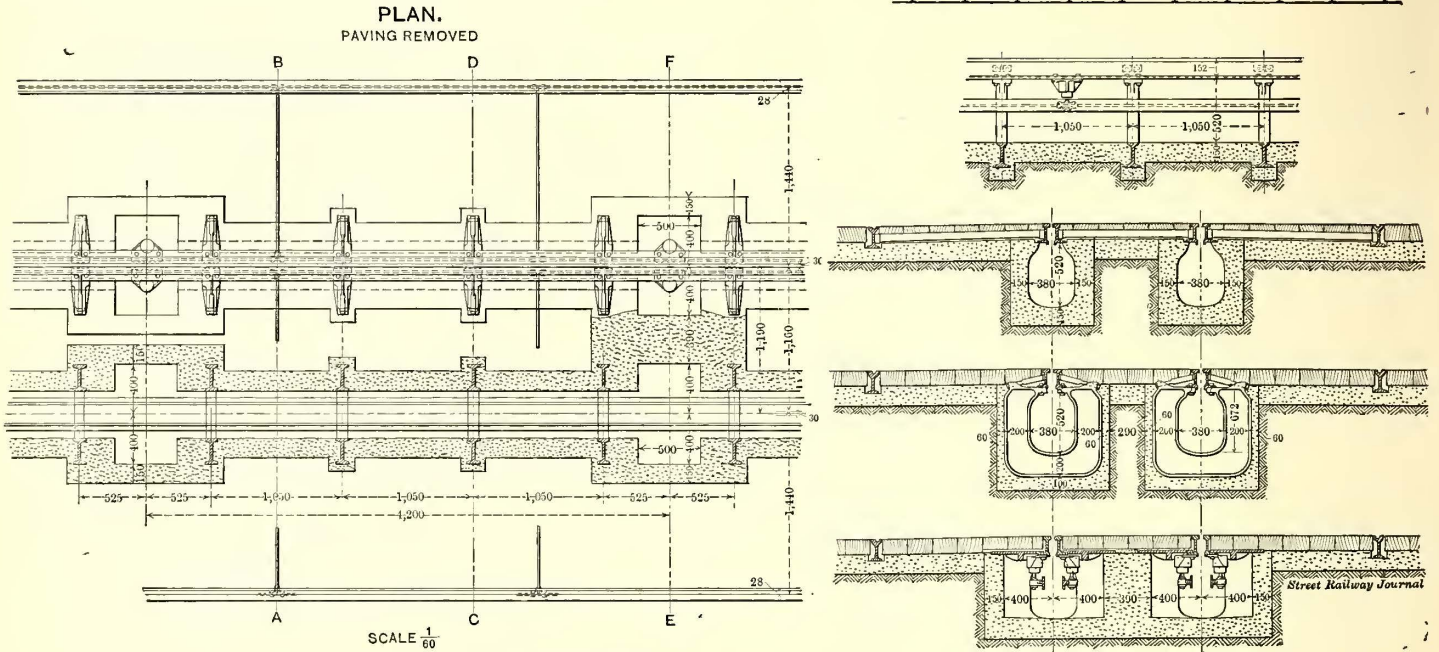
PLANS AND SECTIONS OF UNDERGROUND CONDUIT CONSTRUCTION—PARIS
